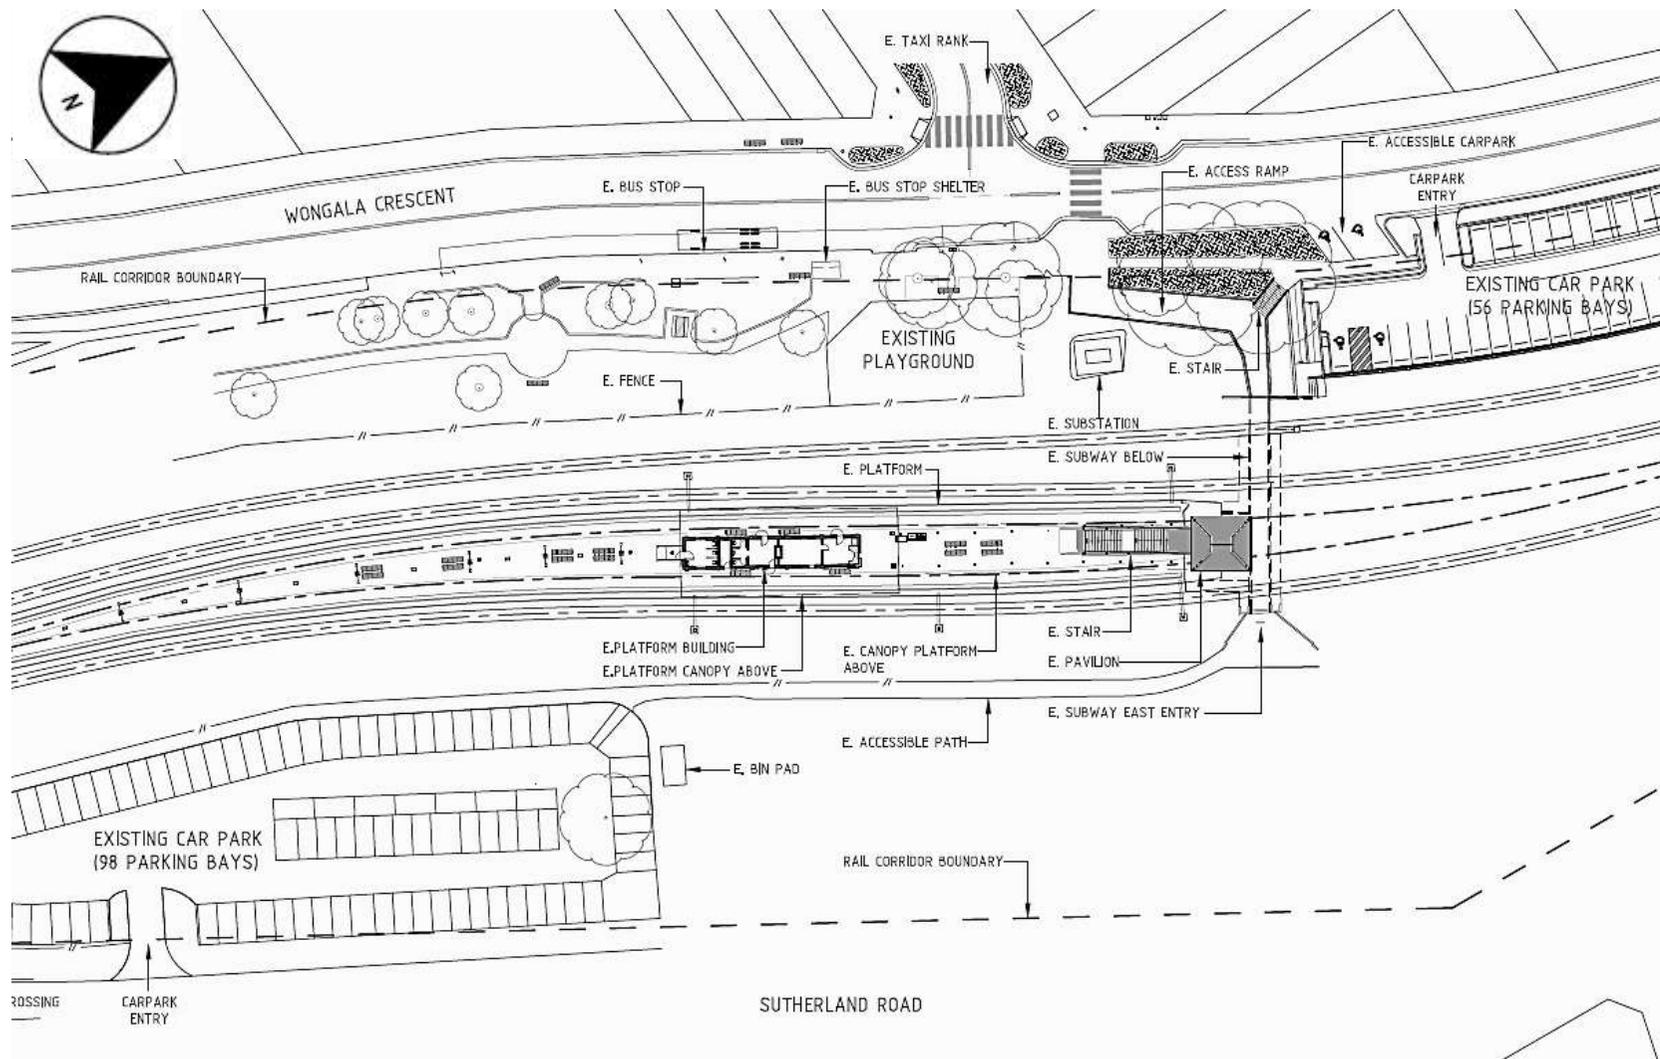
Beecroft Railway Station – Existing Layout. (Source: CCG Architects)
